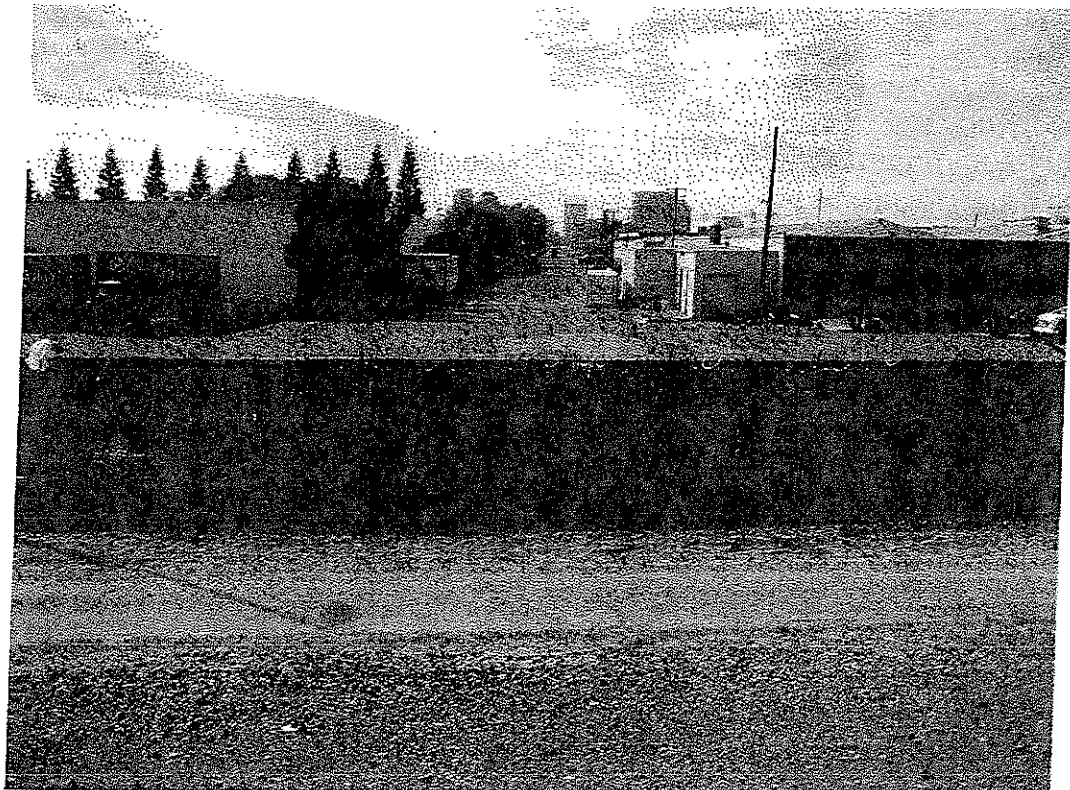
Top of levee looking south on 7th Street at location of Section A on plan
